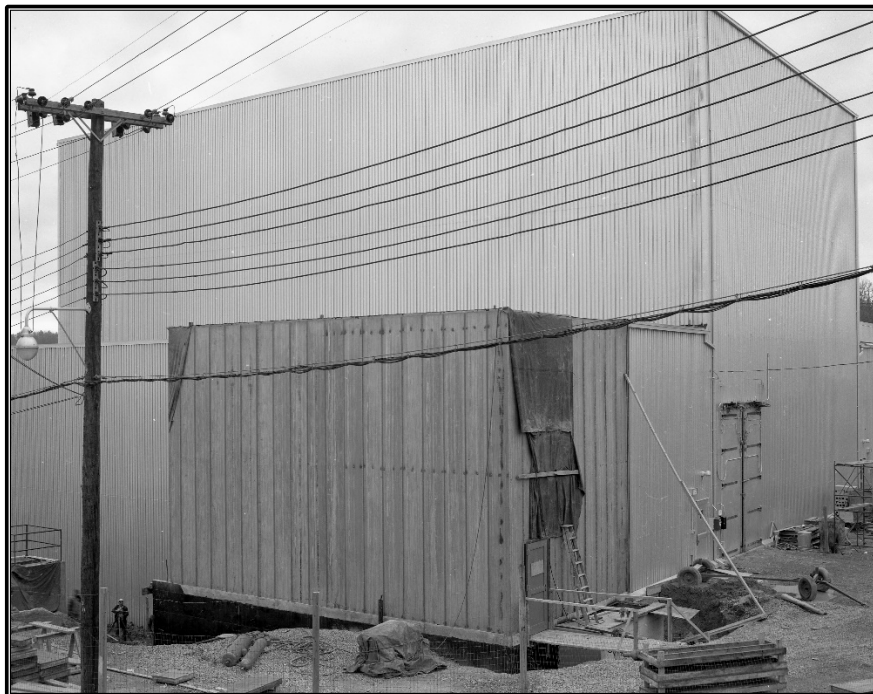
Archival photograph showing the Chang House addition to the north elevation of Building 3042 near completion, facing west, circa 1957 (ORNL Photo 42104).
